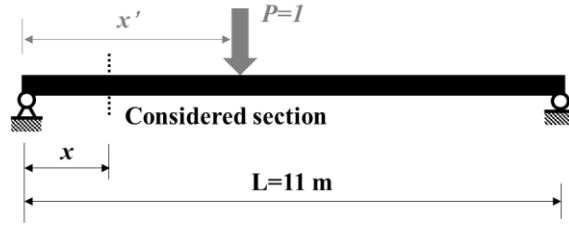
Schematic view of the 11m SM-510 girder under unit single point load
